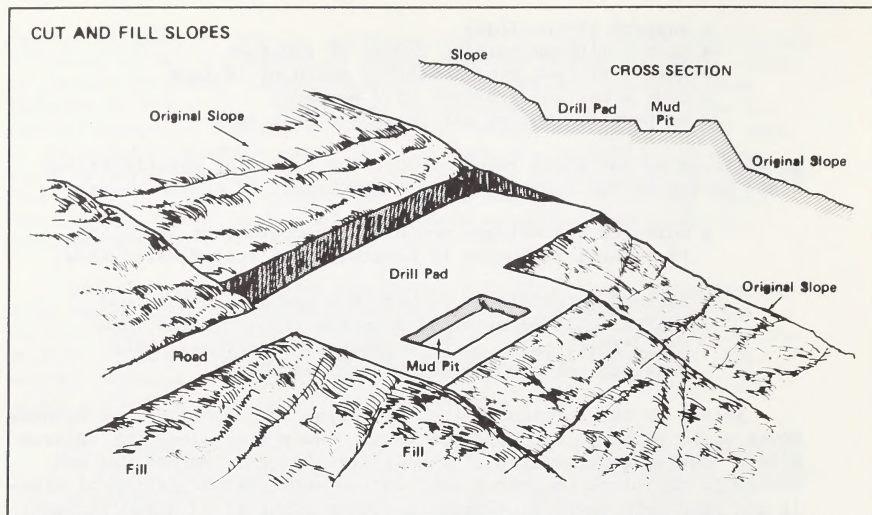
TYPICAL MUD PIT LOCATIONS
